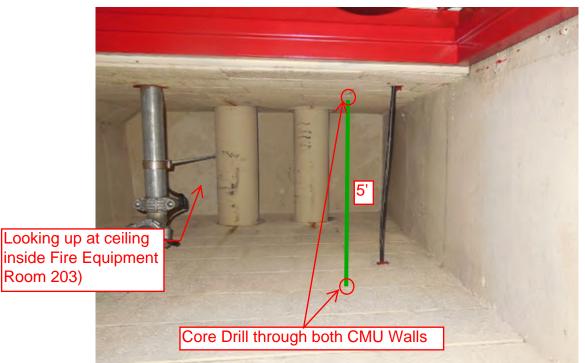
Proposed Conduit Run (Room 203 and Room 205) - looking up at ceiling inside Fire Equipment Room 203.
